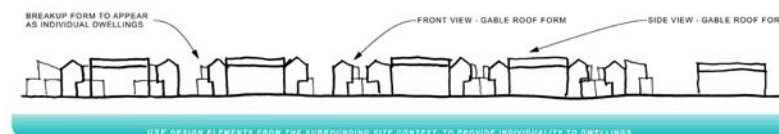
External Street Scene Diagrams (Source: Plus Architecture)
